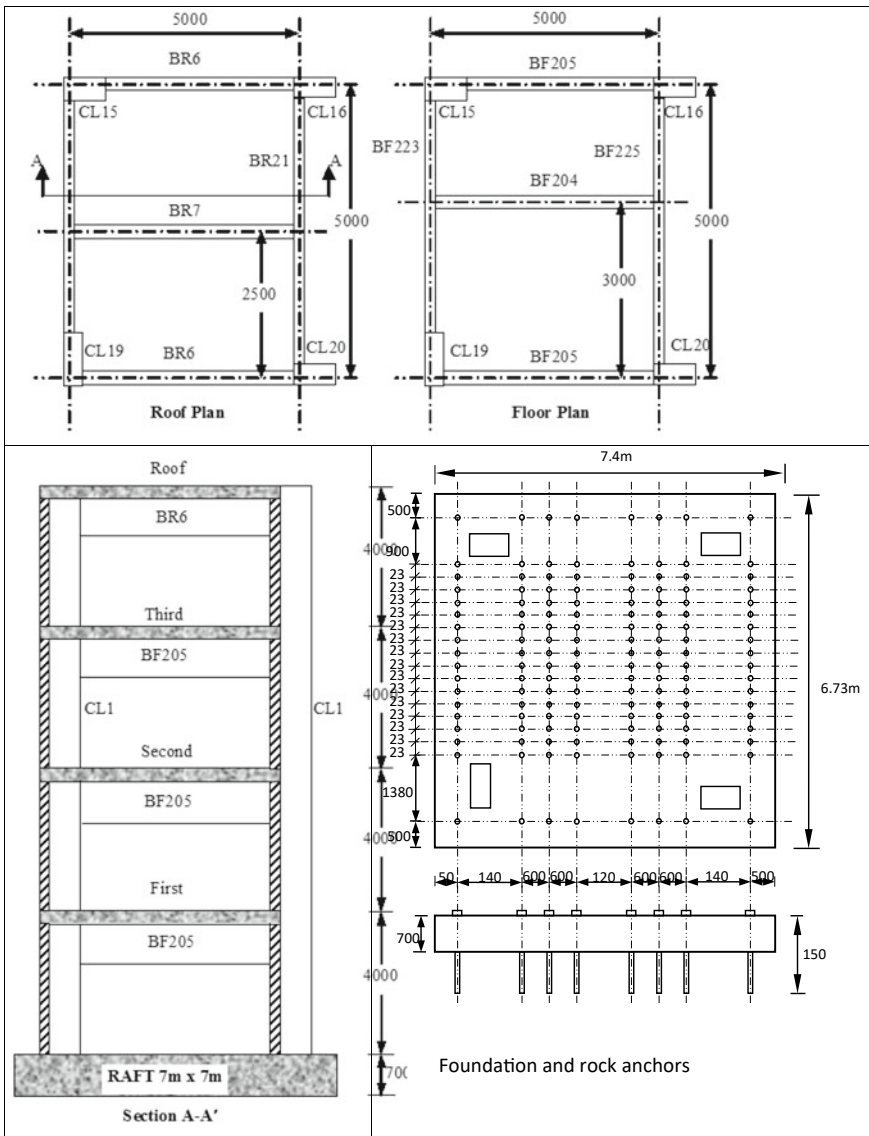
Floor plans, elevation and foundation details of the structure tested
